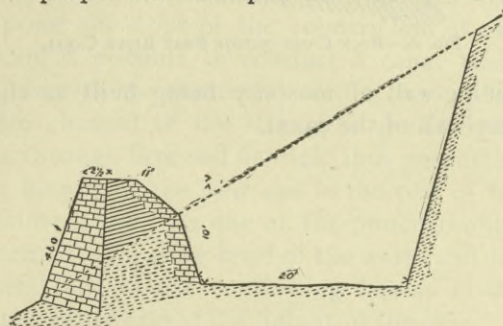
ROCK CROSS-SECTION. TURLOCK CANAL.
